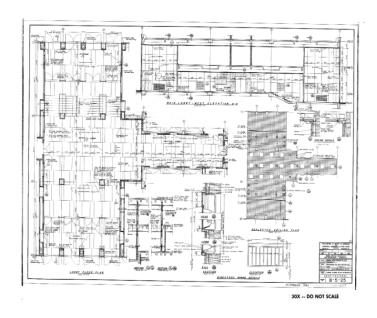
Lobby Floor Plan and Details Source: GSA NCR Technical Library
